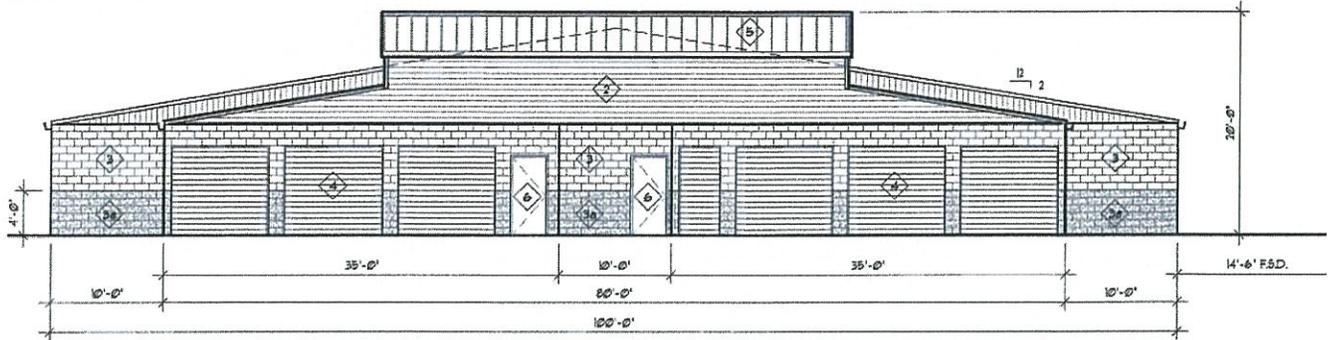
Building #8 and 9 Storage Buildings - View from SR 410; North Elevation (proposed amended)
